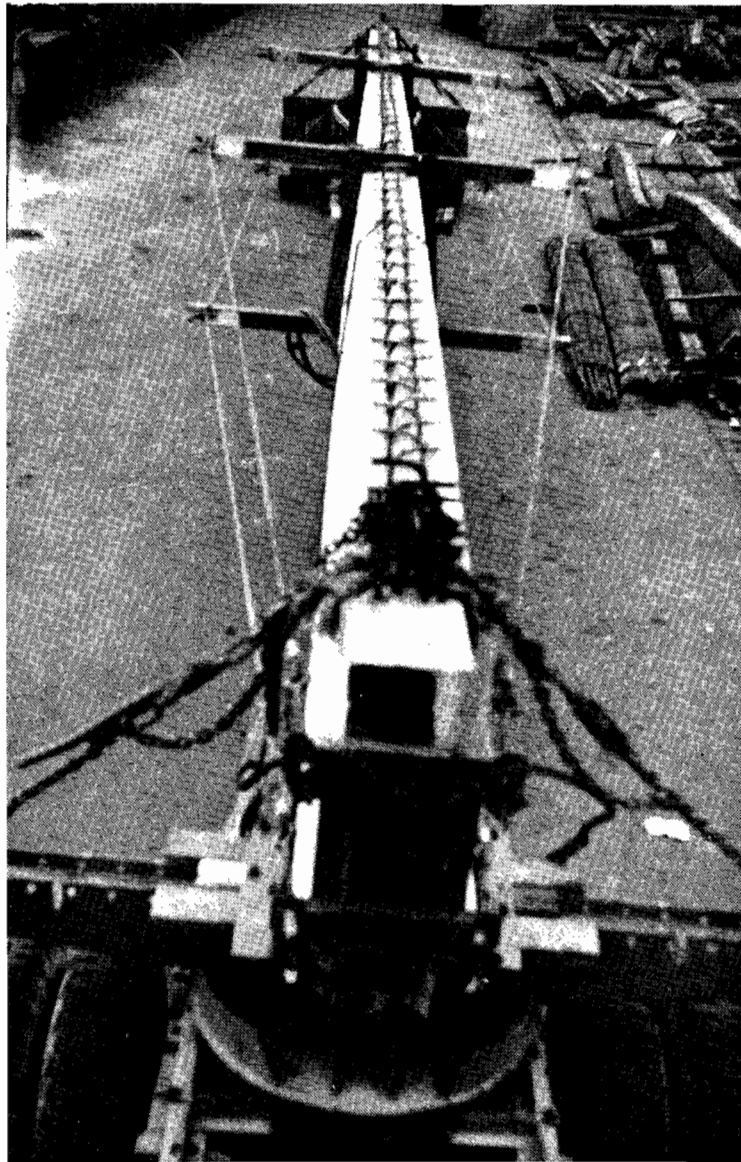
60-ft. beam showing timber bracing frames and longitudinal trussing cables.
